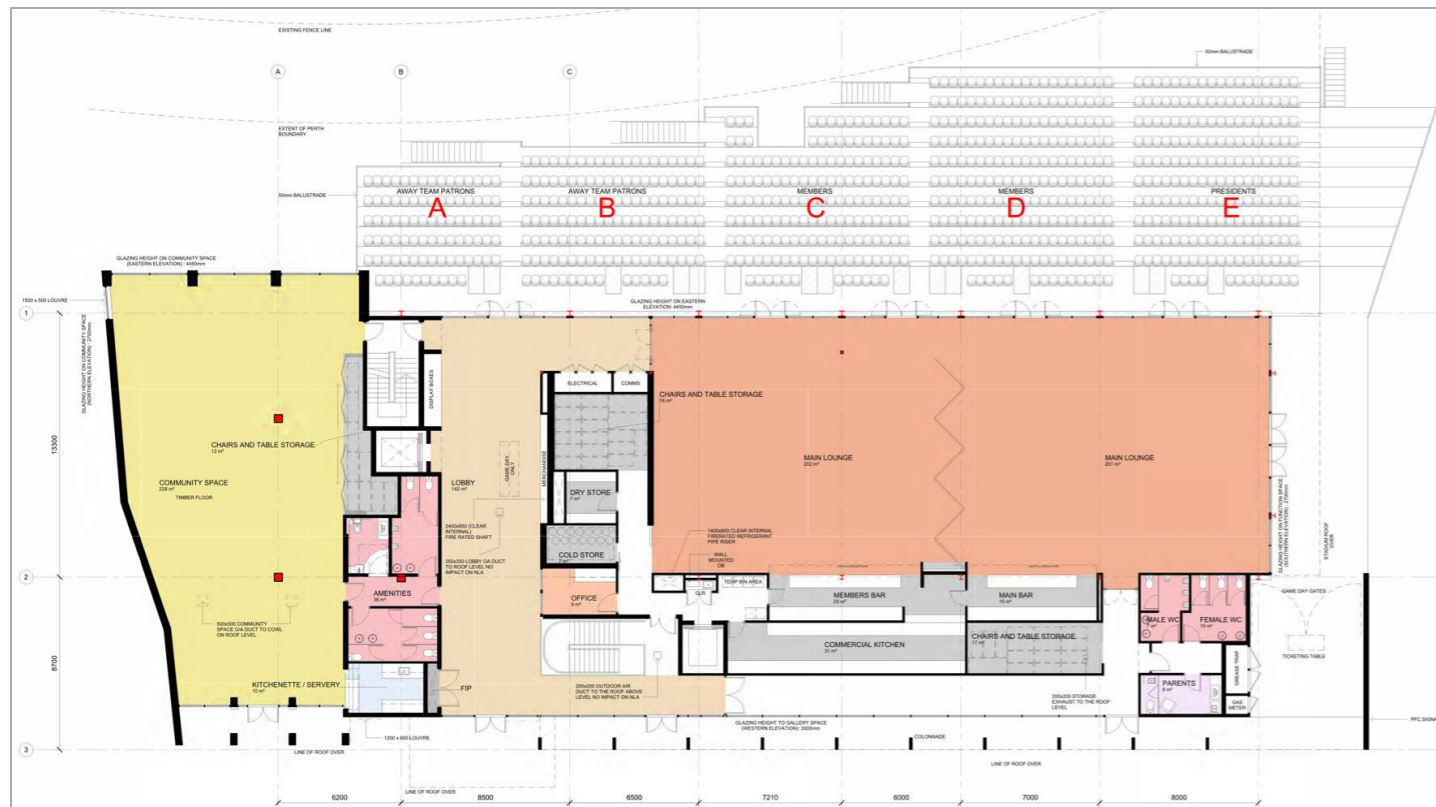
Lathlain Precinct Redevelopment Project – Goddard Street level floor plan (source: Hames Sharley, Rev M dated 14/06/23)
